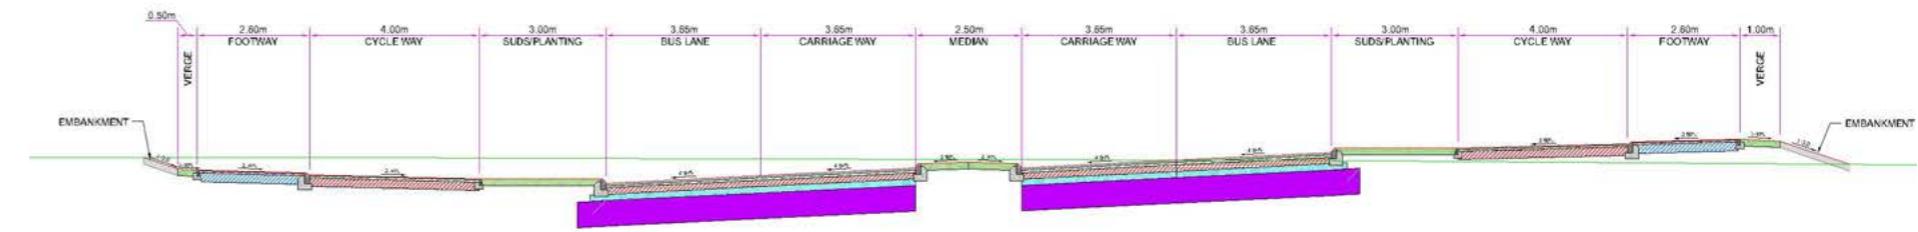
Crawley Western Multi – Modal Corridor Typical Cross-Section (Between 4 arm junction and South of the River Mole Bridge)
